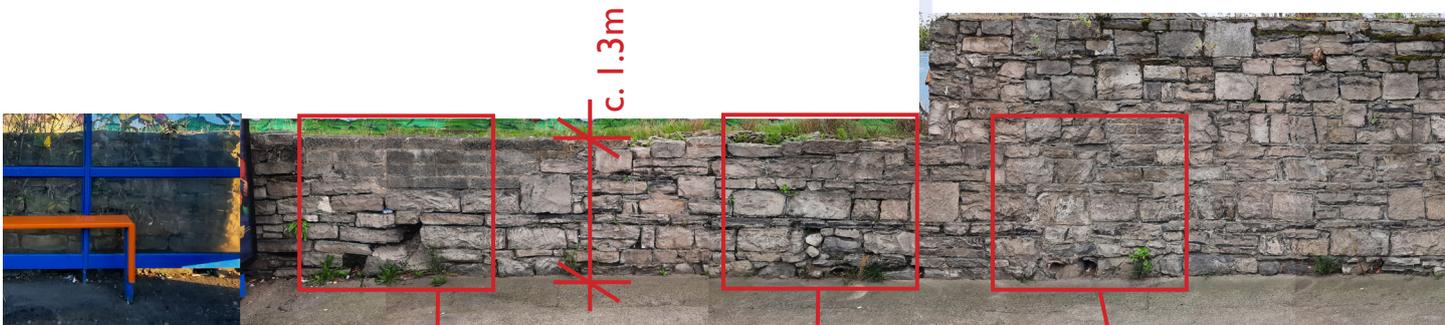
Existing Boundary Wall - Elevation C - Emmet Road
